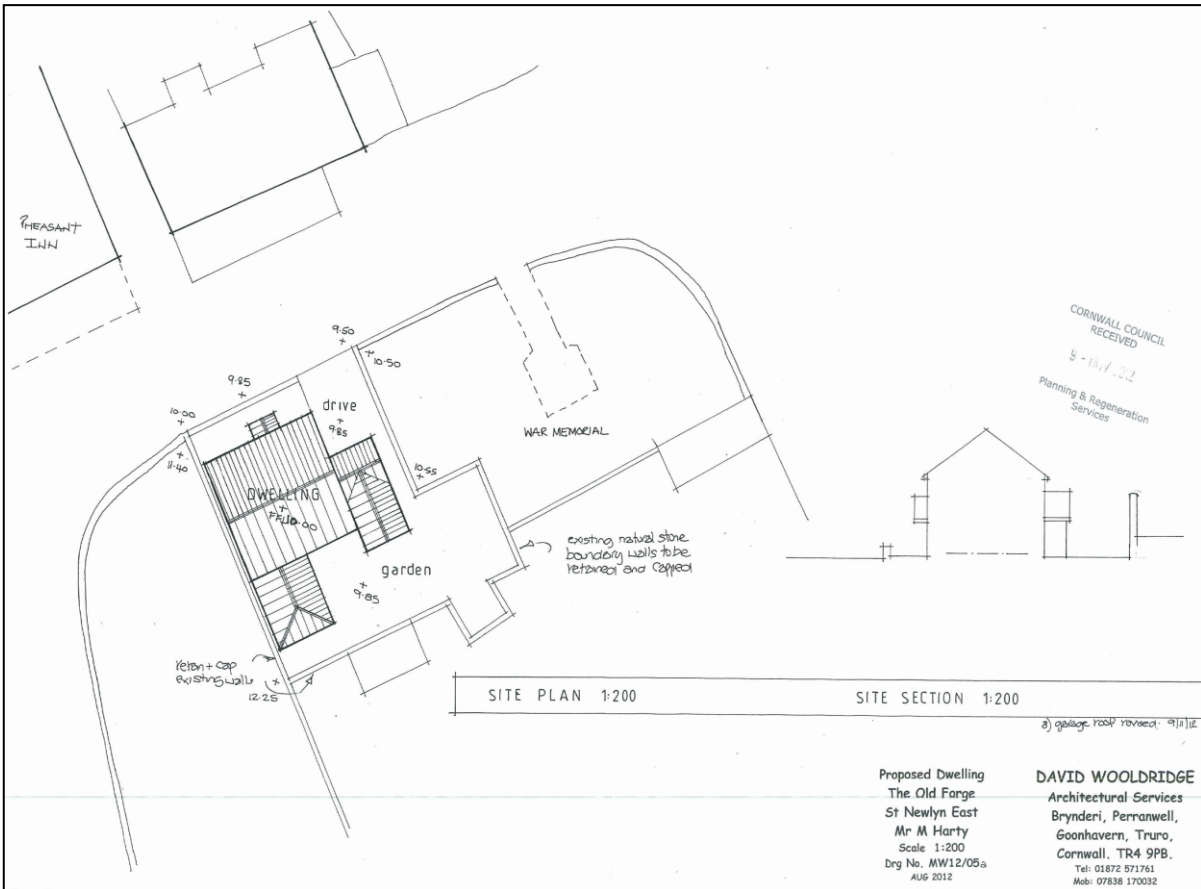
Architects plan as provided by the client, showing the proposed build (see location above).
